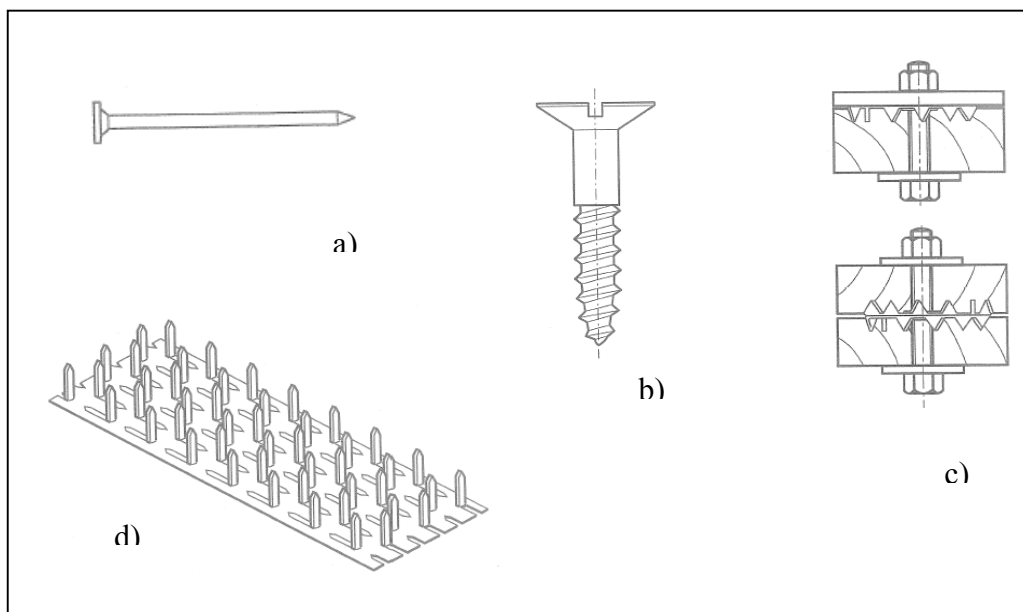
Examples of timber connectors used in constructions: (a) nails; (b) screws; (c) shear-plates; (d) toothed-plates (Anon. 1995a).
